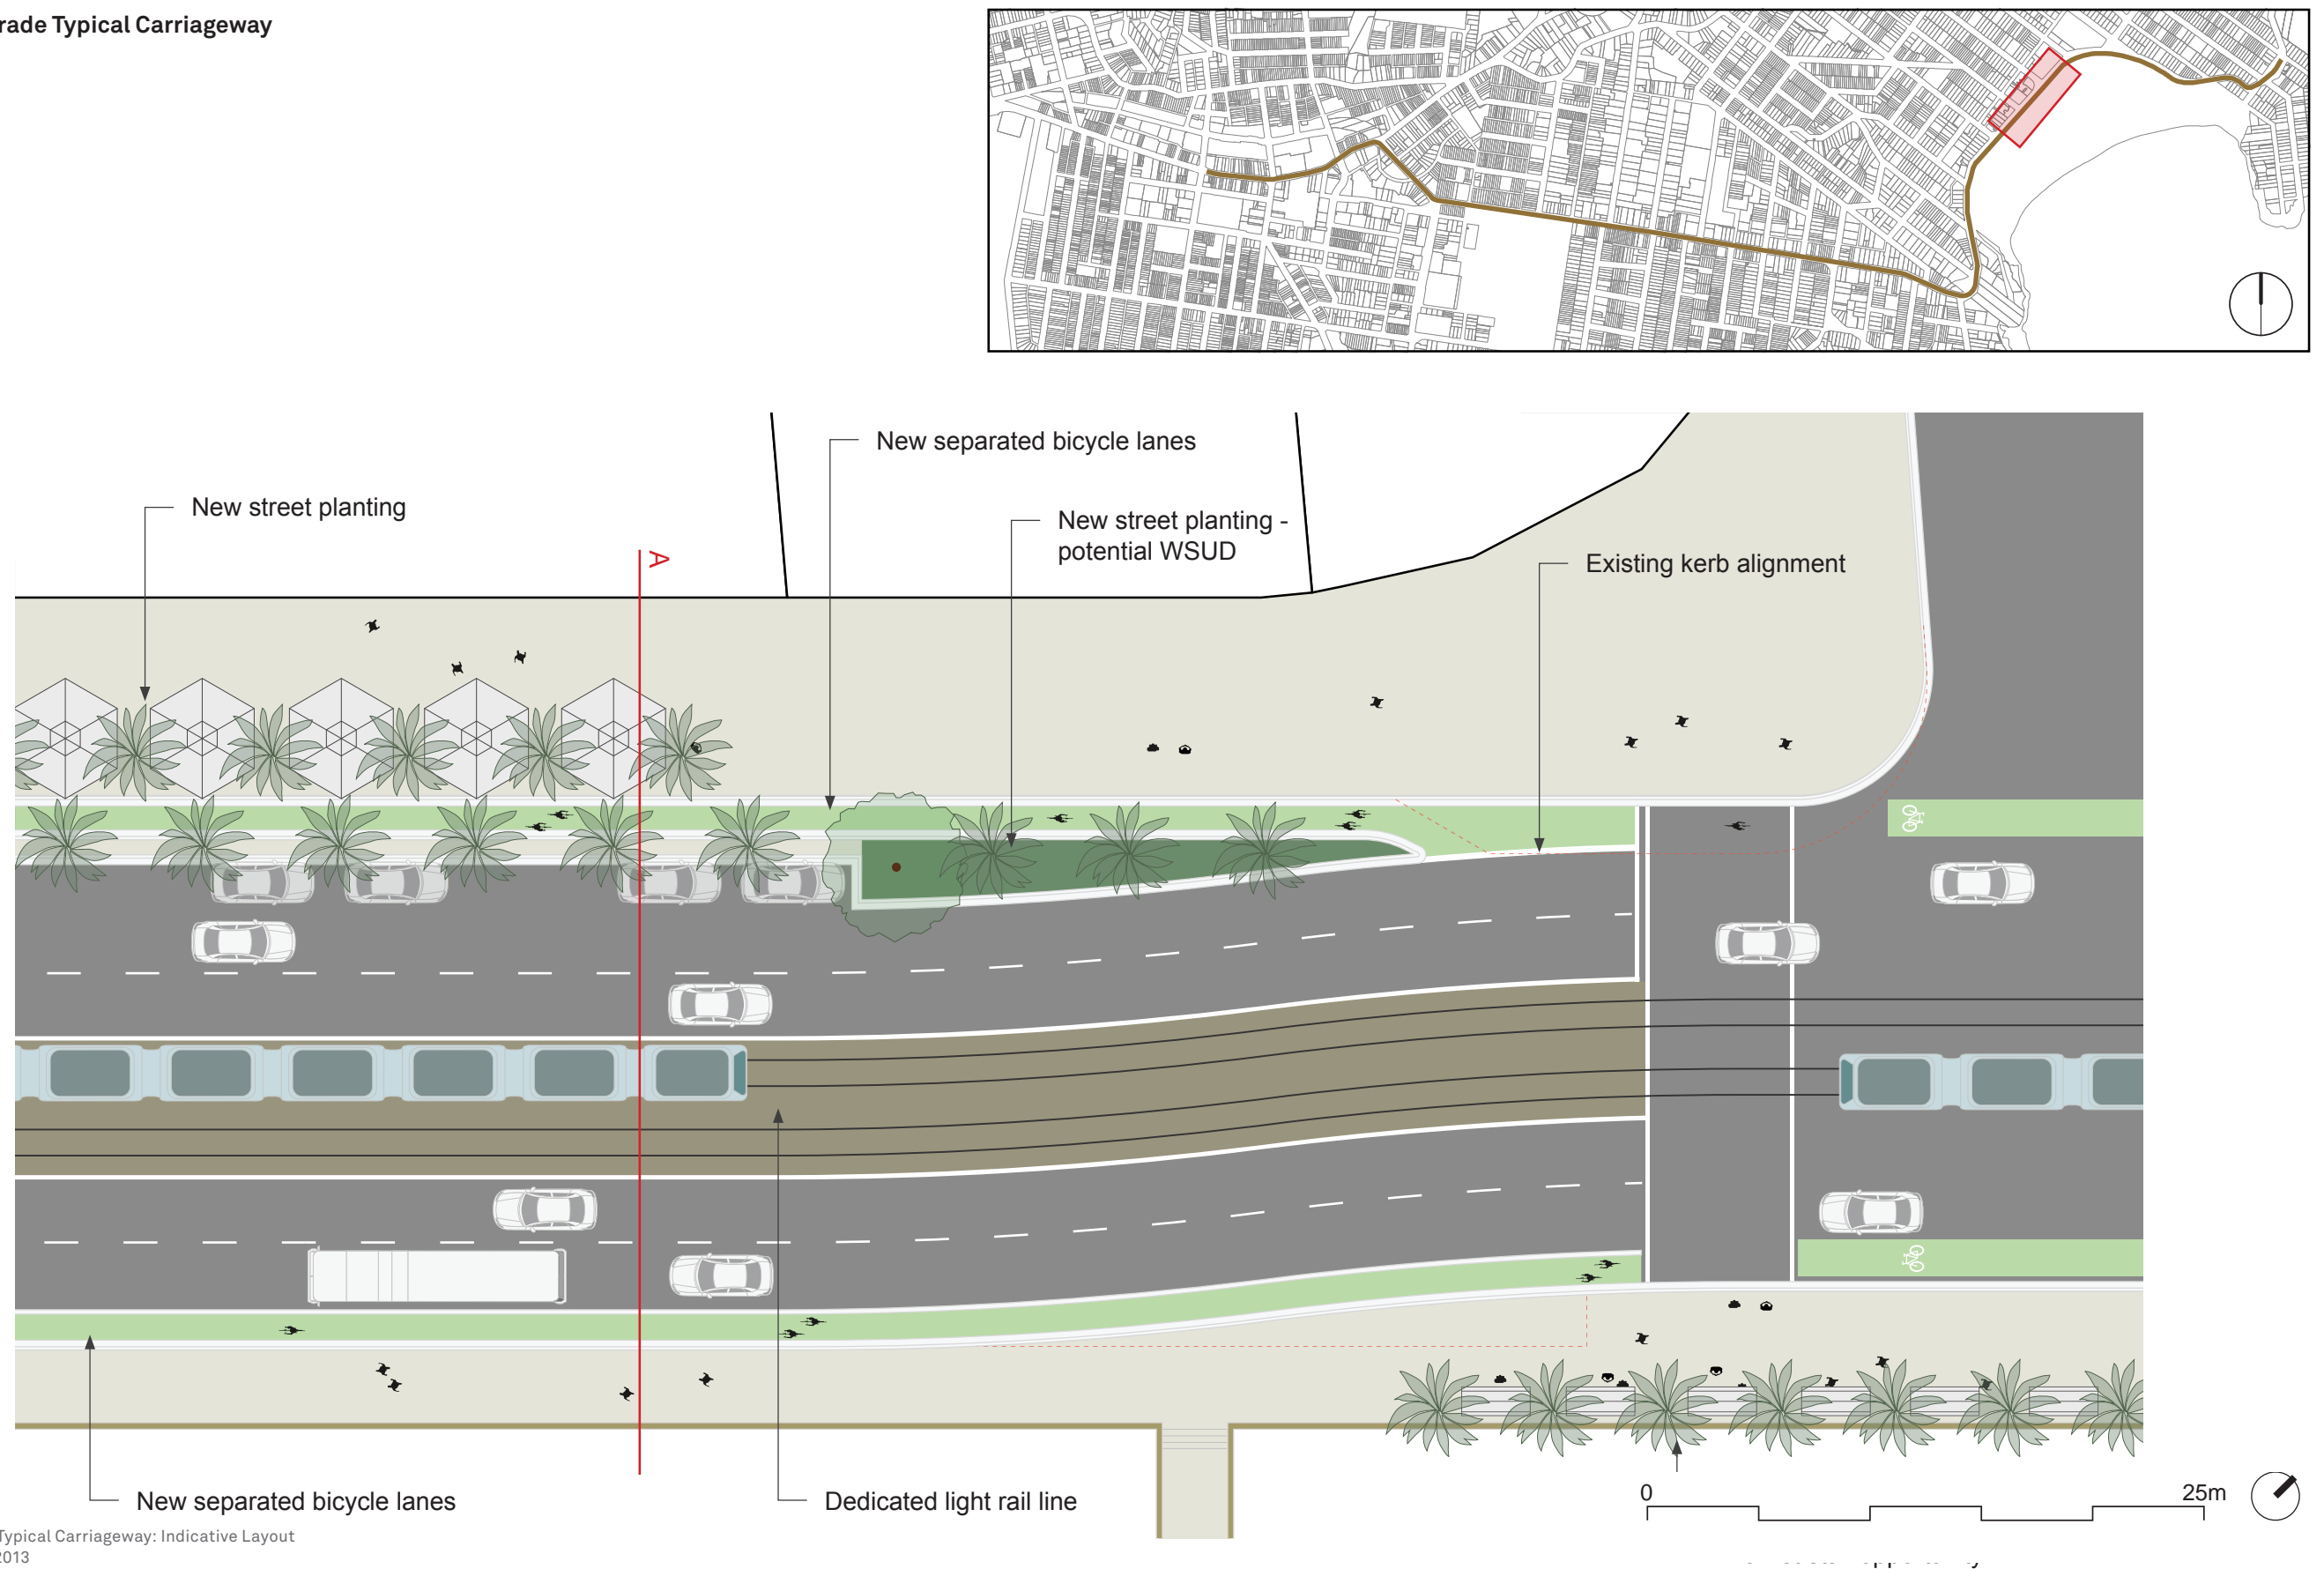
Campbell Parade Typical Carriageway: Indicative Layout
